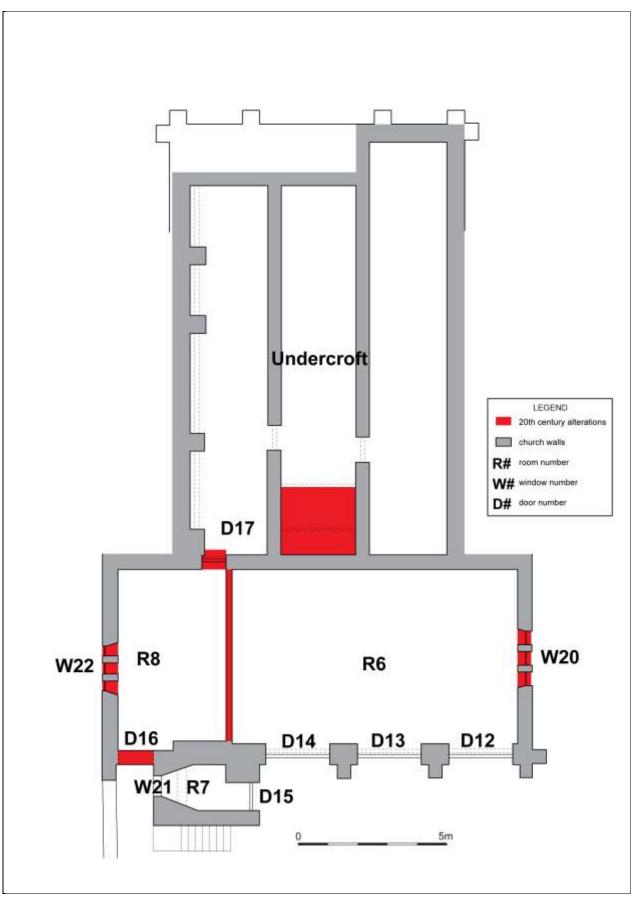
PLAN OF FEATURES AND PHASING IN THE BASEMENT.
